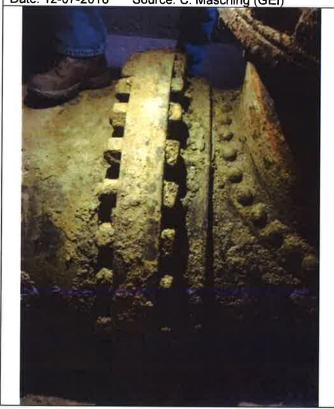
Flange on 42-inch conduit line located furthest west in vault.
